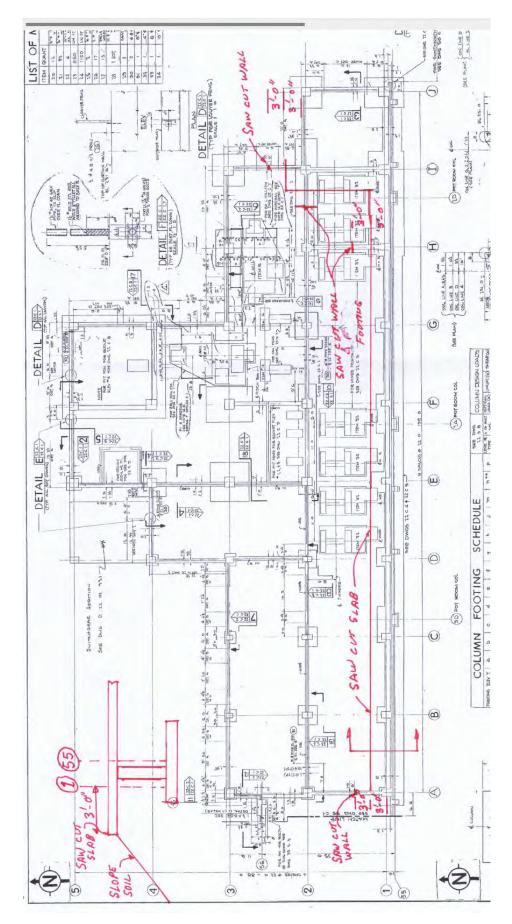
Saw Cut Line in 722 Paste Plant Concrete Slab
